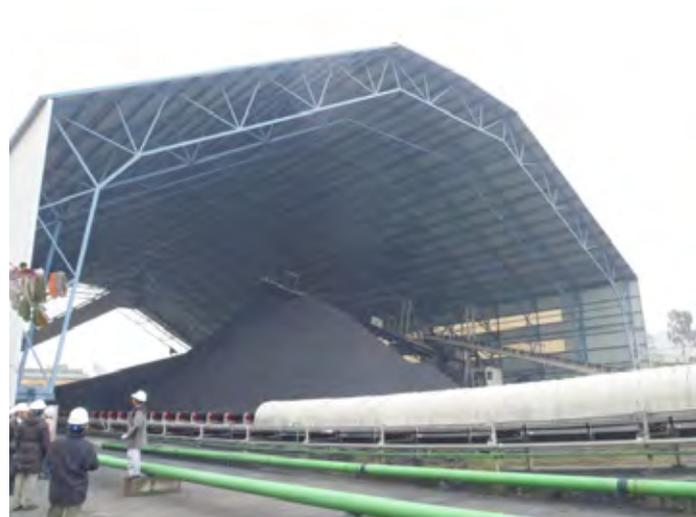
Roofed coal storage yard in Uong Bi 7
